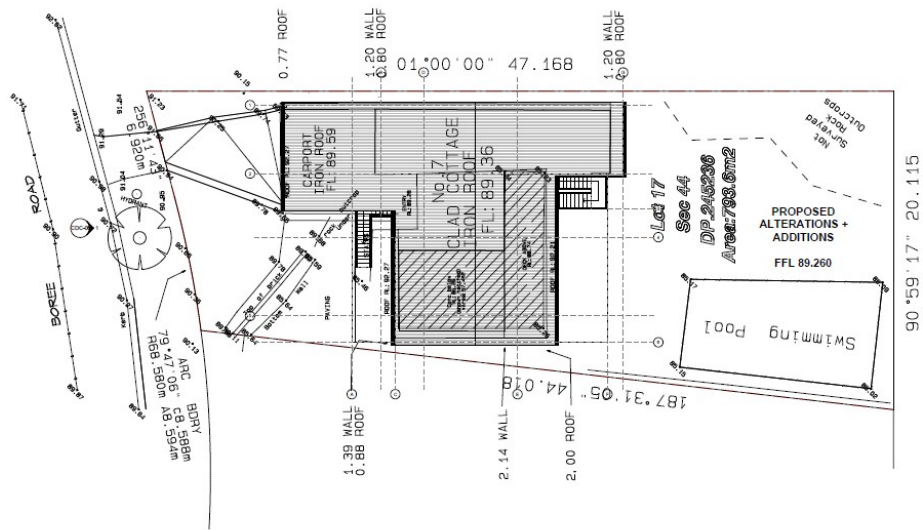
Site plan showing the existing structures on the land and the site's boundaries
